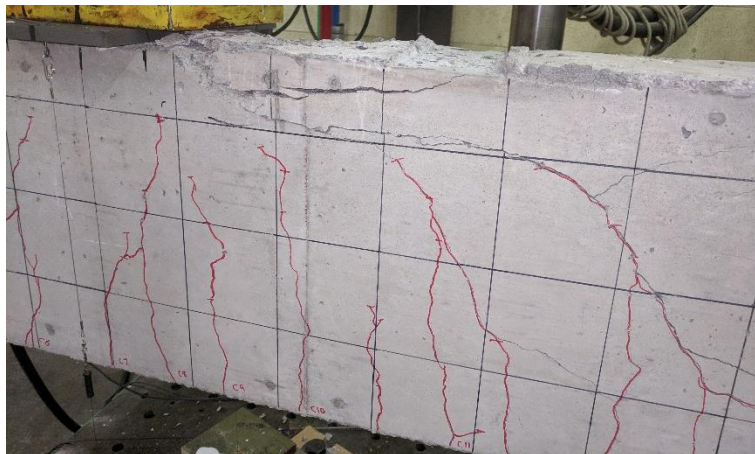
BM 6.5-150: Crack patterns at failure
